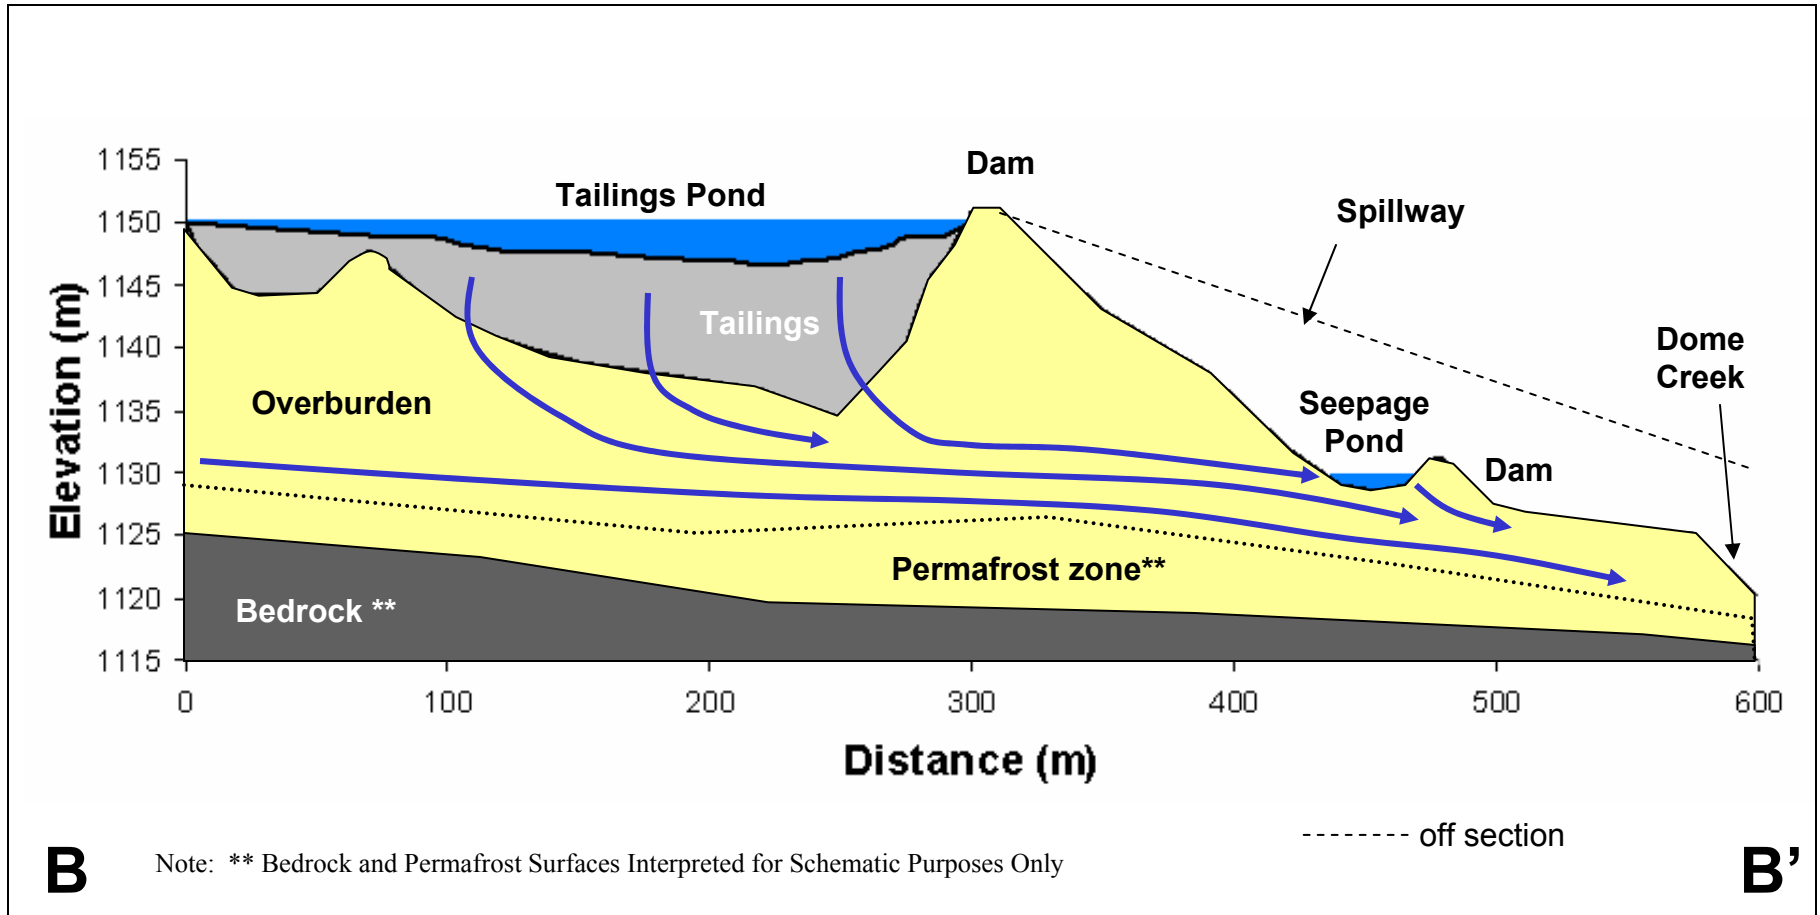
Schematic Interpretation of Longitudinal Section B – B' Showing Elevation of Tailings Pond and Tailings Relative to Seepage Pond. (note vertical exaggeration) and Interpreted Groundwater Flow
